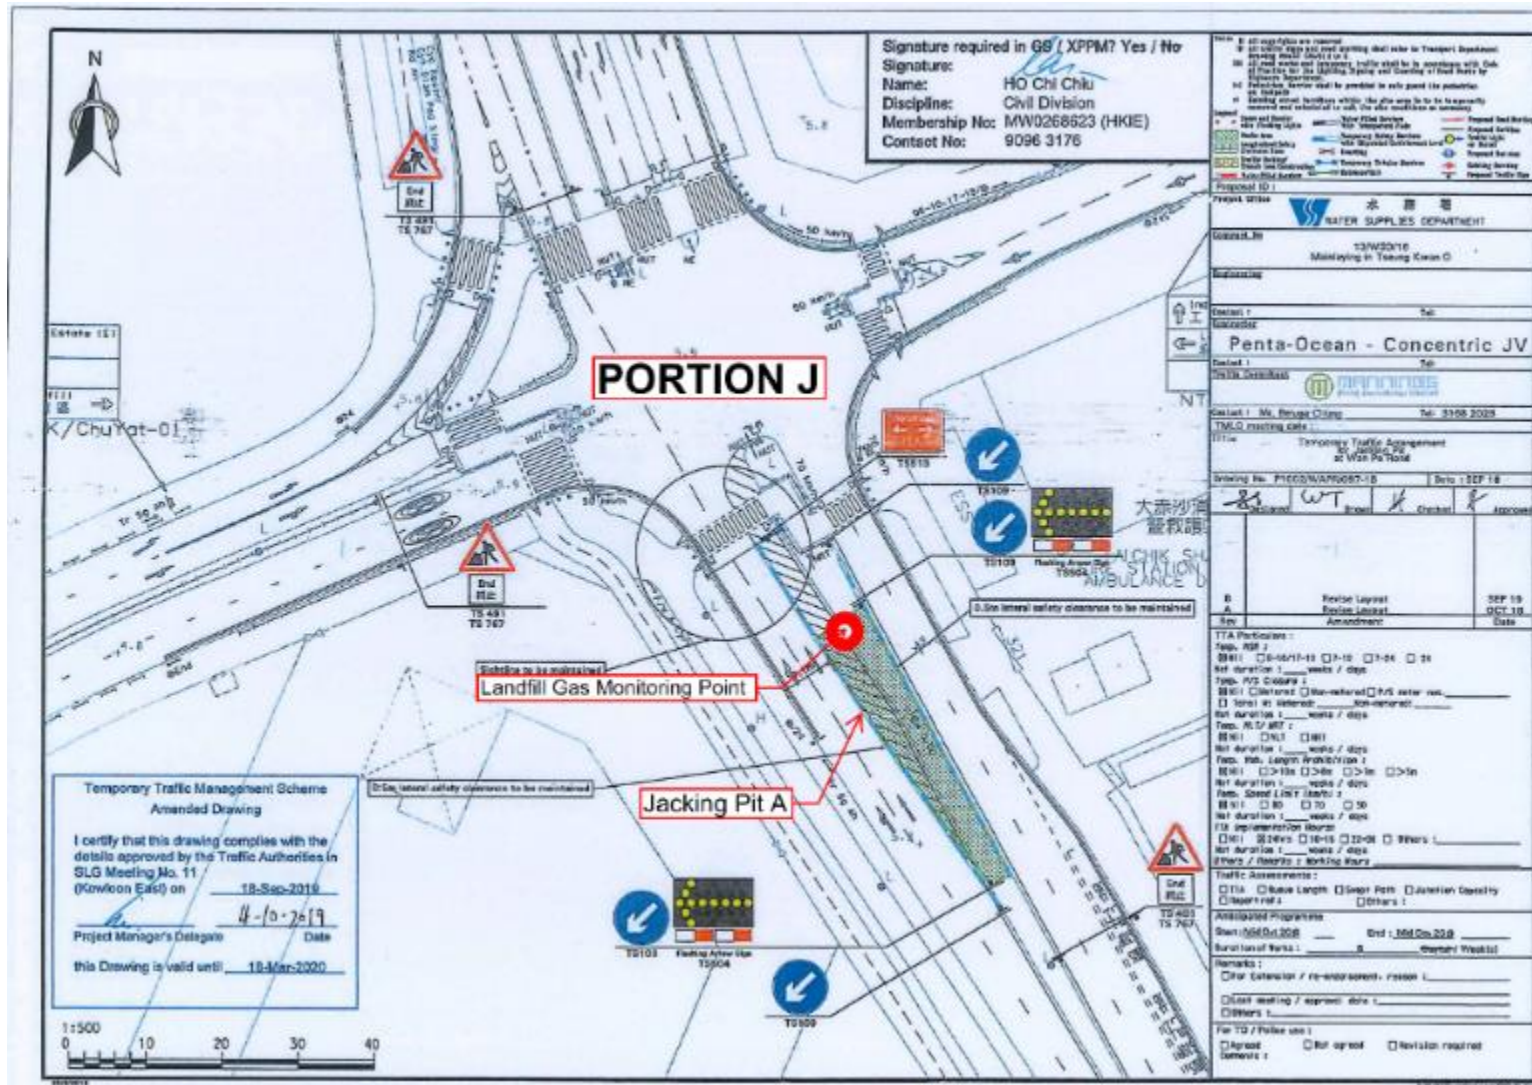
Location Plan for Portion J – CH. A13+50 to CH.A 14+00 (Pit A)
